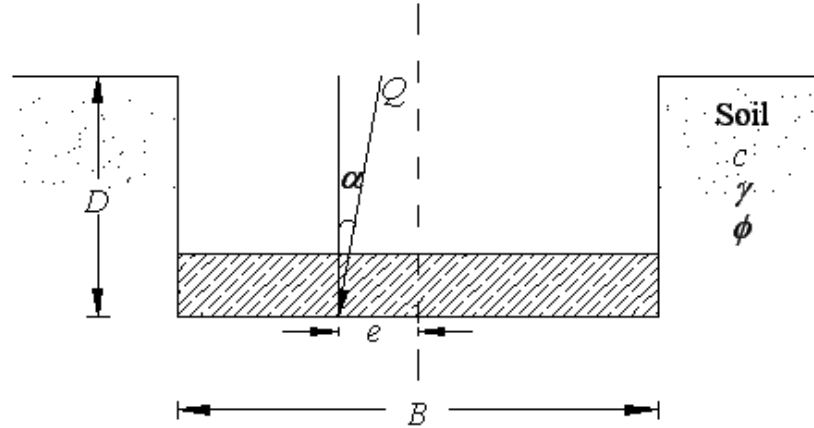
Eccentric inclined load on foundation [Meyerhof (1963)]
